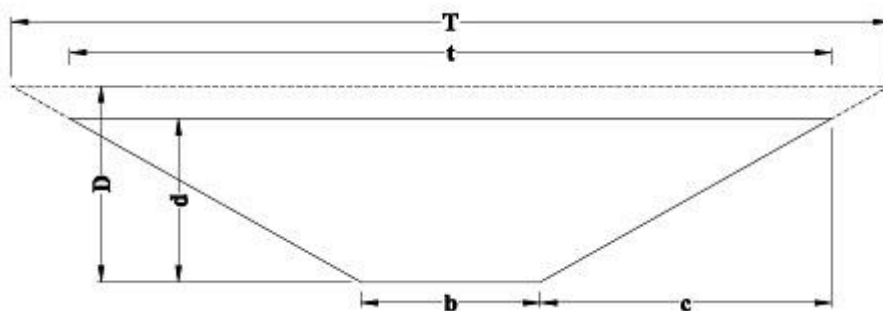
Trapezoidal Cross-section. (Source: Murty, 2009)
